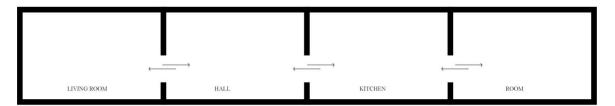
Plan types of the house with rooms aligned side by side (S.Sevimbige archive, 2018)
